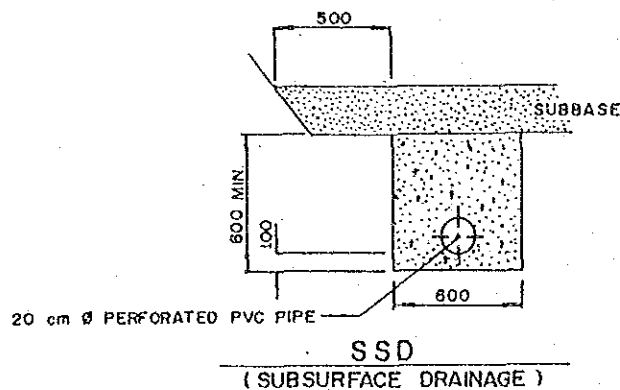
TYPICAL CROSS-SECTION OF SUBSURFACE DRAINAGE
